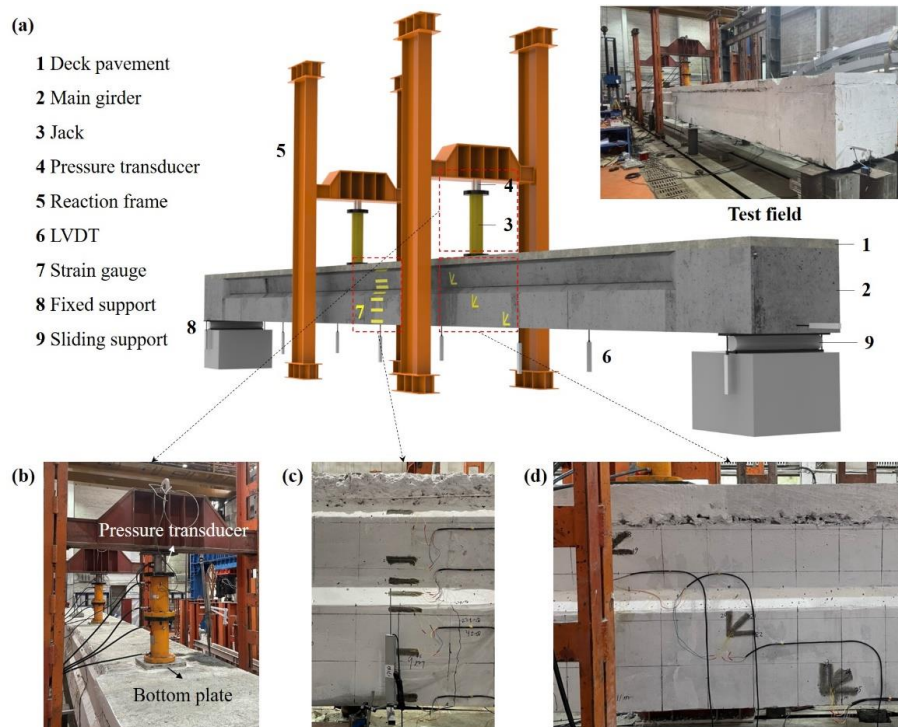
Loading and sensor arrangement for flexural test: (a) overall layout; (b) jack and pressure transducer; (c) strain gauge arrangement in mid-span; (d) strain gauge arrangement at shear position
